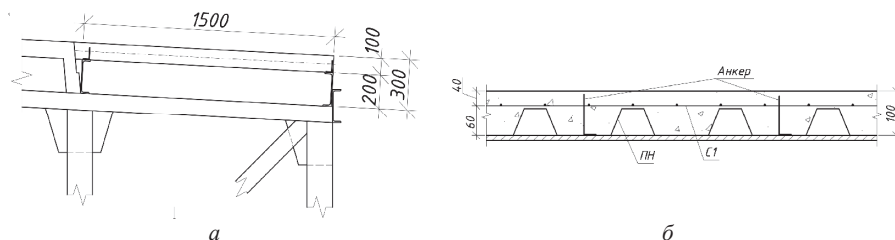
Arrangement of the covering plate on the profiled flooring and metal beams:
